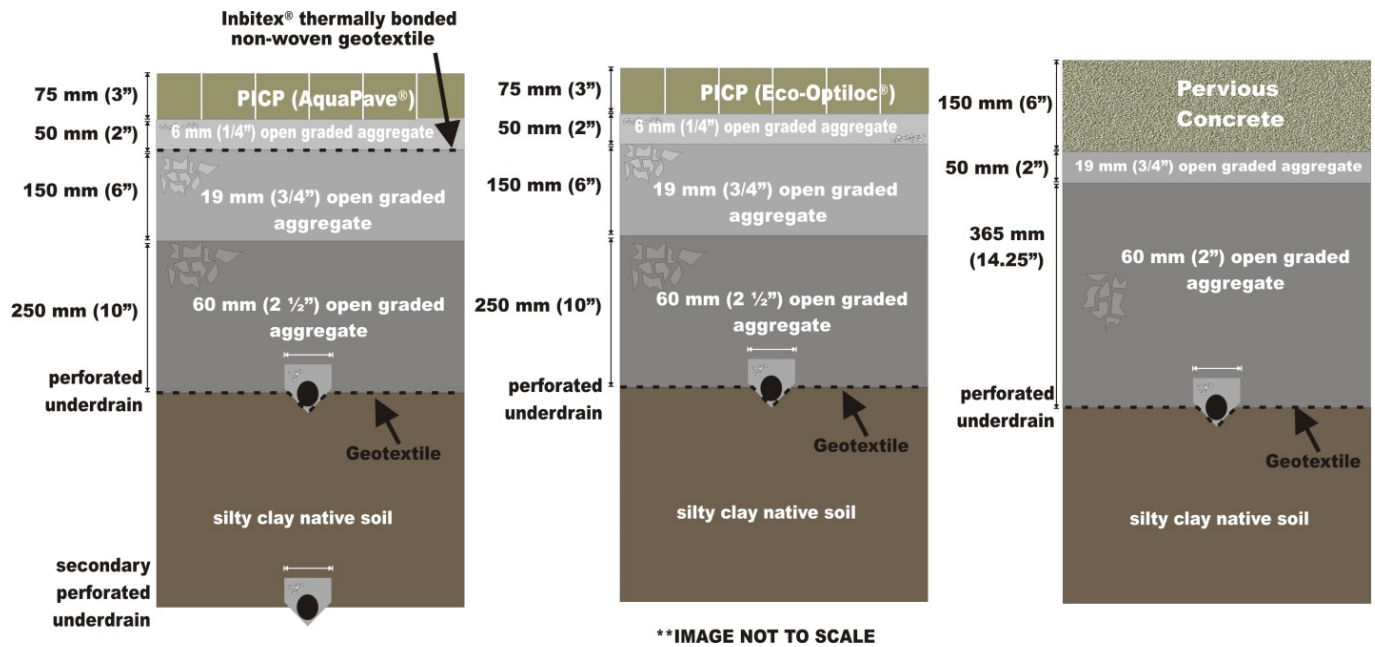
From left to right, cross sections of the AquaPave (AP) Eco – Optiloc (EO) and pervious concrete (PC) pavements.
